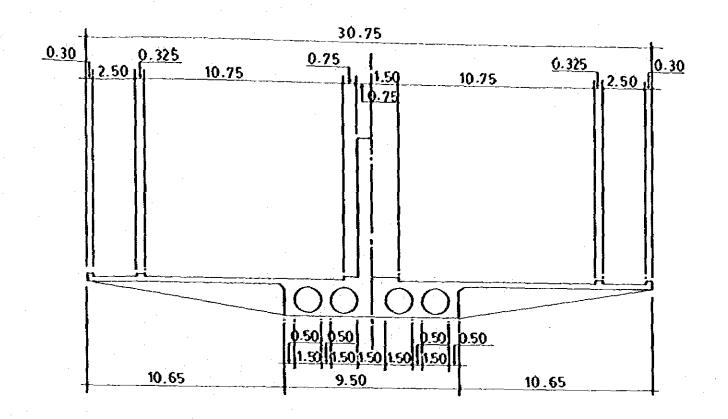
CROSS SECTION OF BOX GIRDER BRIDGE
